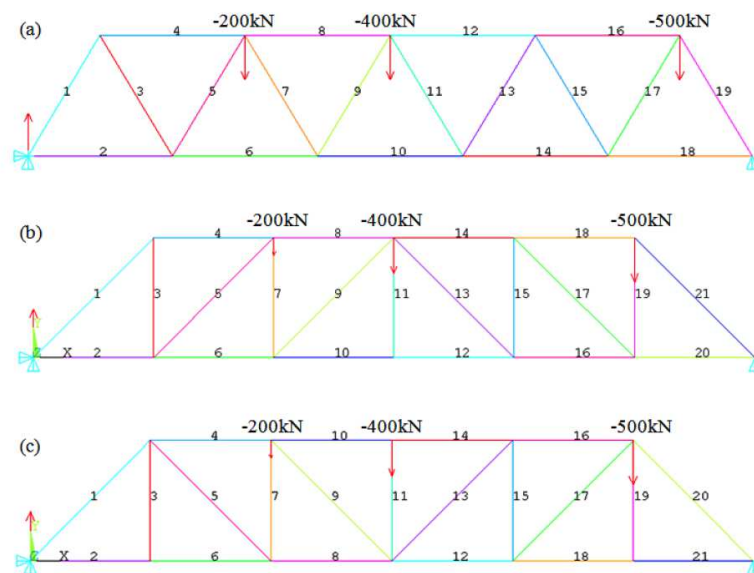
(a) Warren Truss (b) Howe Truss (c) Pratt Truss
